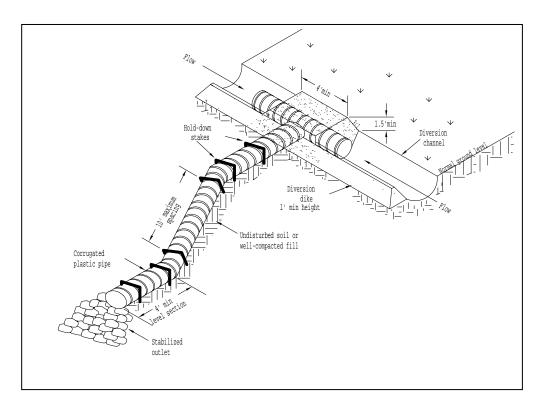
Temporary Downdrain and Inlet Detail
